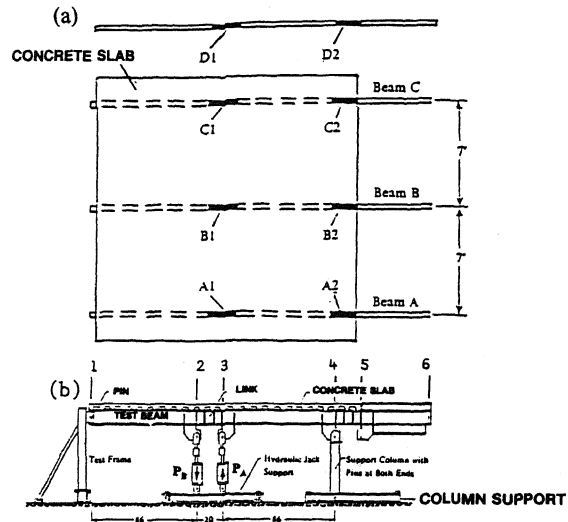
(a)Plan of Specimen Location, and (b)Elevation of K-Braced EBF Subassembly.
